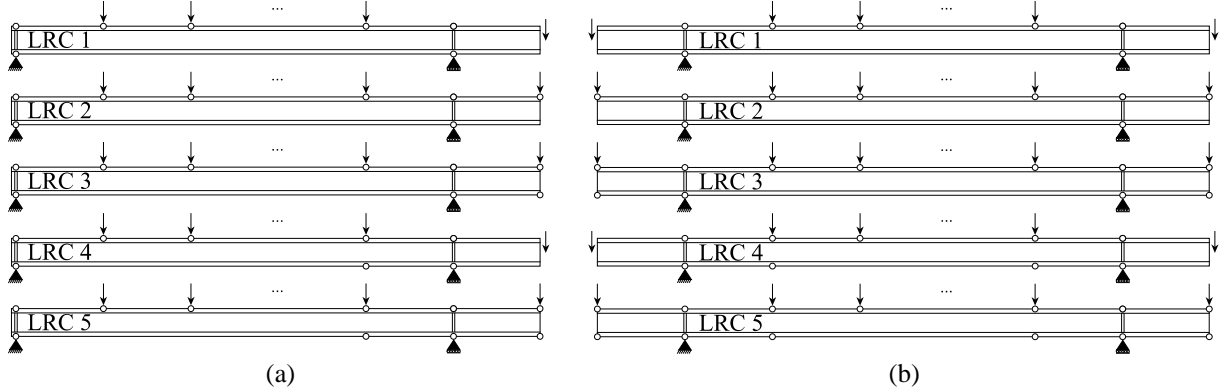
LRCs: (a) single-overhanging girder; and (b) double-overhanging girder.
